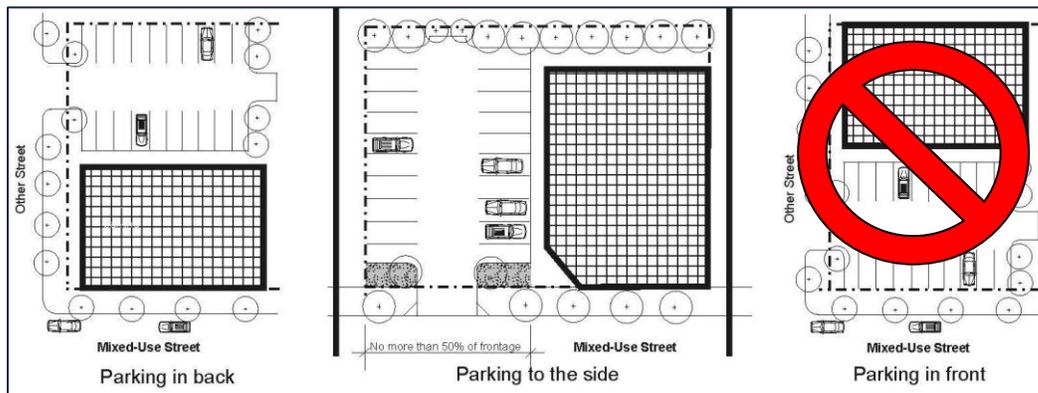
Off-street parking may be to the rear or side of a building but not in front.
